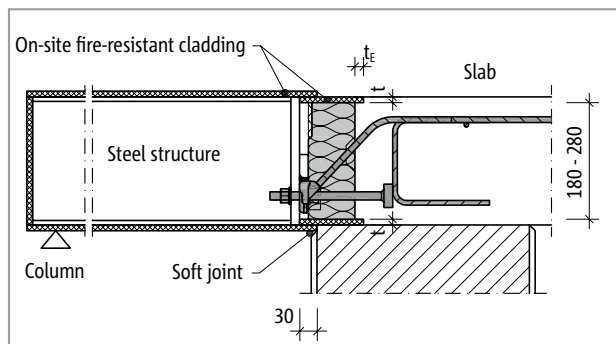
Schöck Isokorb® T type SQ: On-site fire-resistant cladding for Isokorb® and steel structure; cross-section
